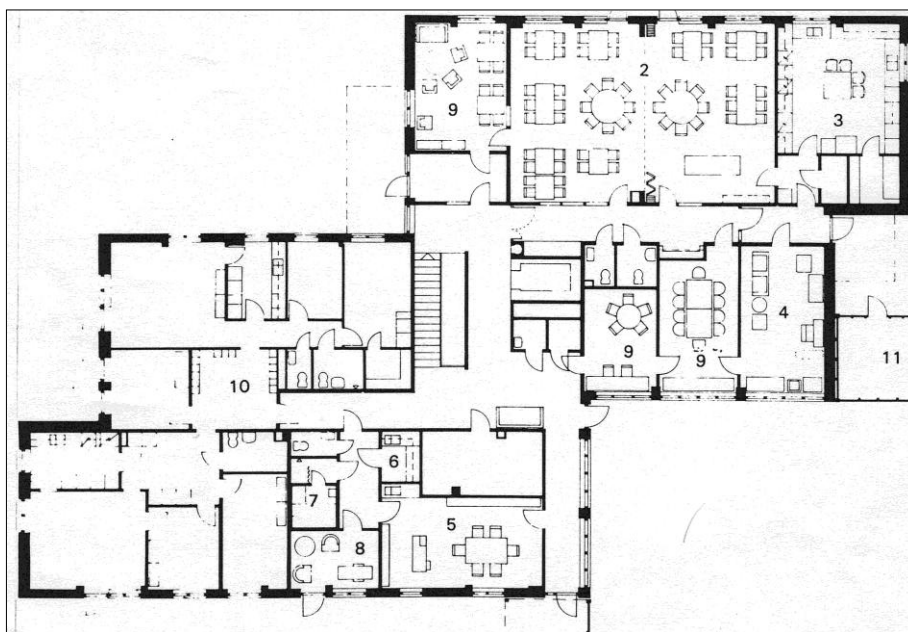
Ground floor of Prästgårdshagen, built in 1983 by the municipal housing company Familjebostäder.* Legend: 2. Dining room, 3. Kitchen, 4. Laundry, 5. Ceramics workshop, 6. Photo lab, 7. Sauna, 8. Relax room, 9. Common spaces such as children's play room, workshop, office (later TV room), 10. Day-care centre (run by the municipality), 11. Storage.
